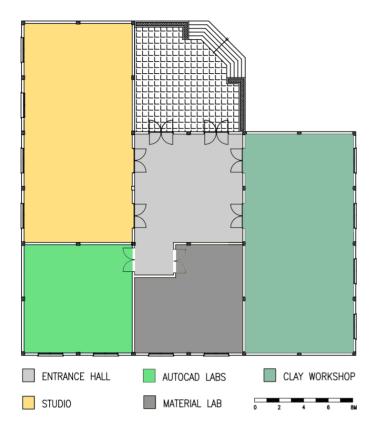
E3 Block First Floor Plan currently in use
